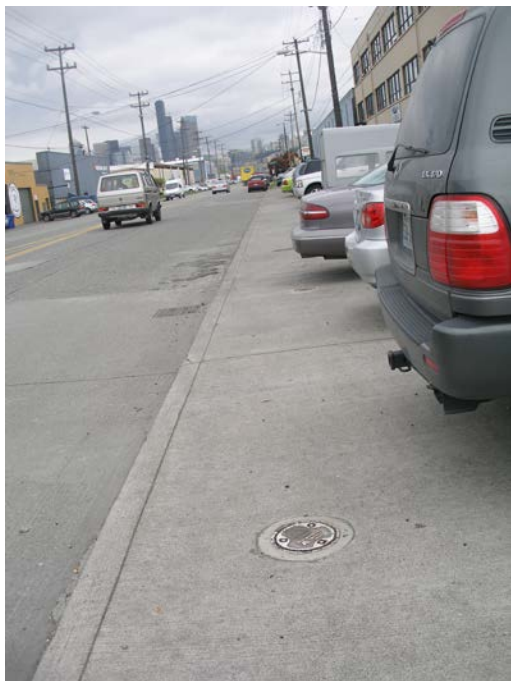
Monitoring wells CMW-5 and CMW-6 located on the right-of-way of 6th Ave S – from the north
